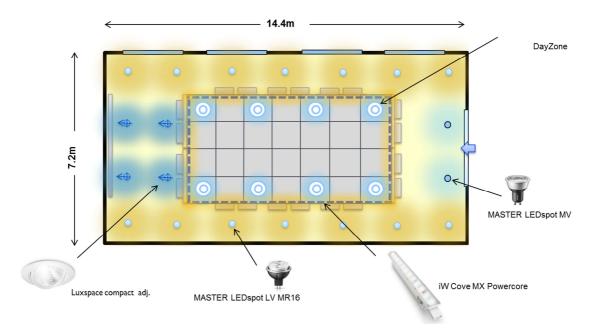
EXAMPLE OF LIGHT PLAN OF MEETING AREA
